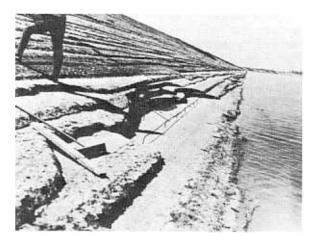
View of Cheney Dam at Sta. 110+00 showing moderate breakage of facing—October 1966, 3 years after construction. Photo P835-D-56108
